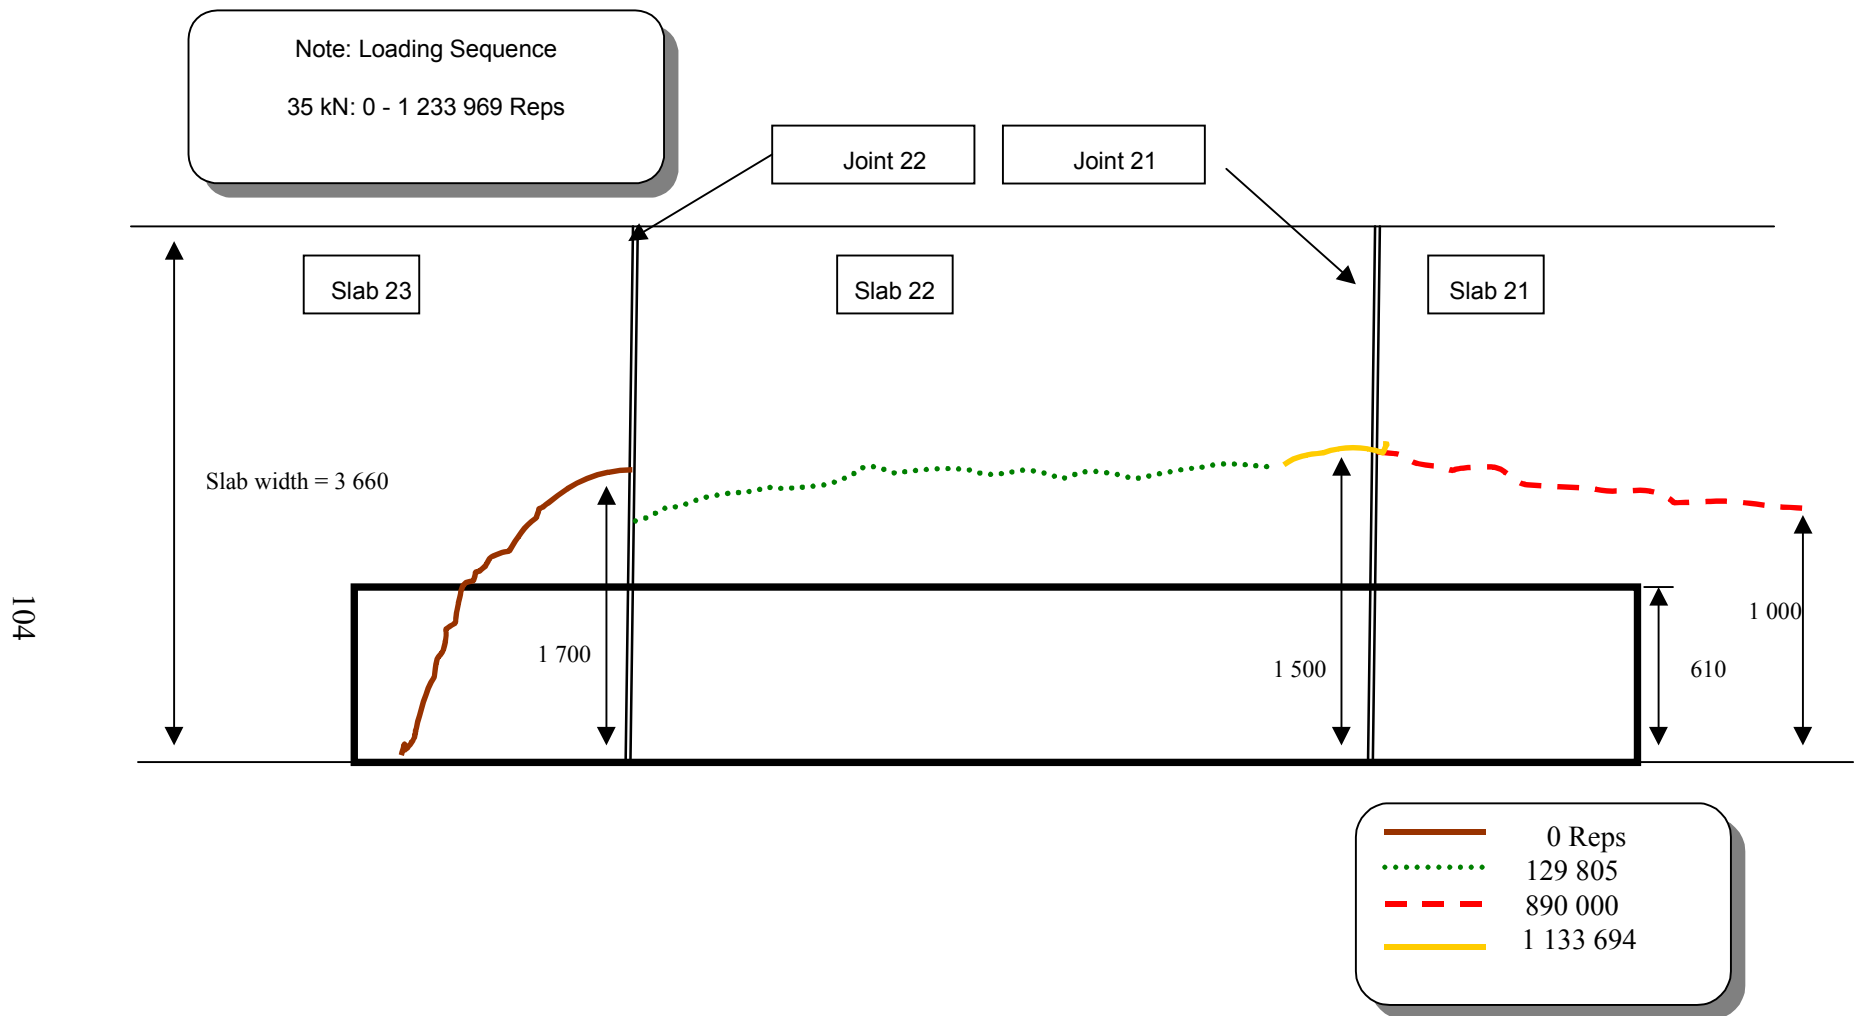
Schematic of crack development, Test Section 527FD (not to scale).
